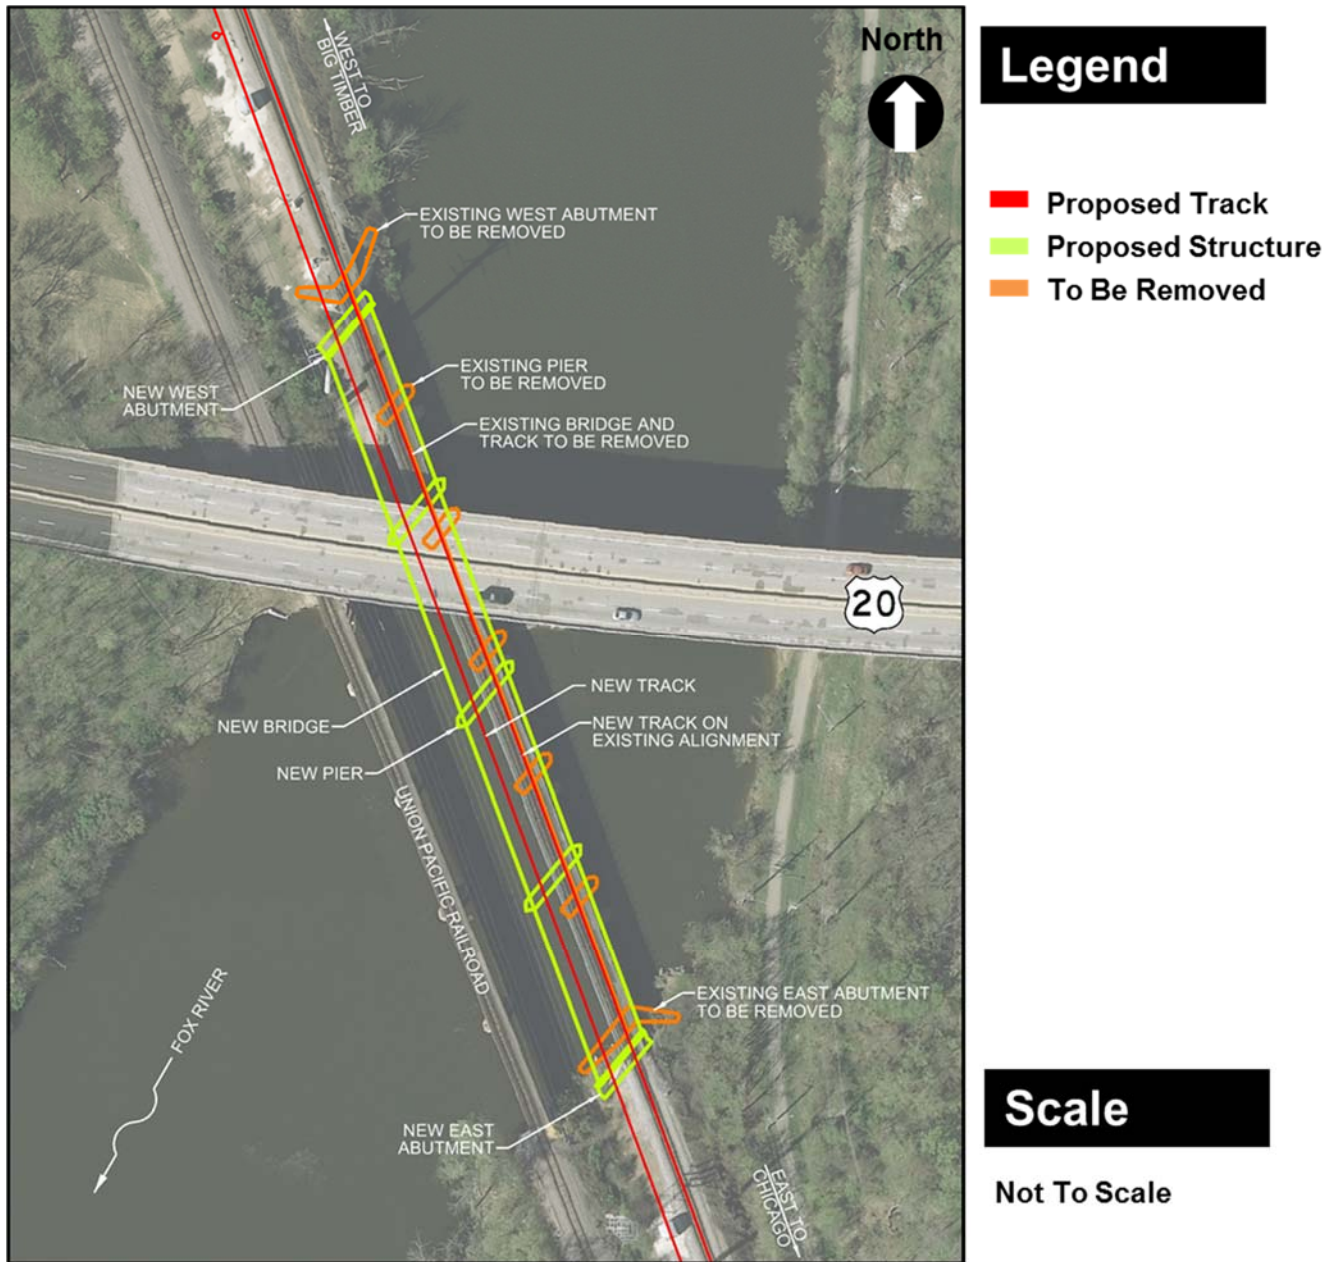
Preferred Build Alternative – Construct a New Double-Track Bridge on Existing and Downstream Alignment
